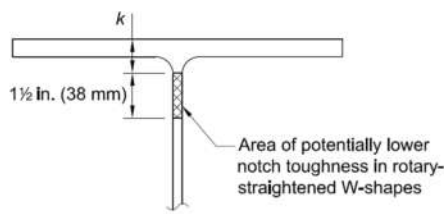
Representative "k-area" of a wide-flange shape.
